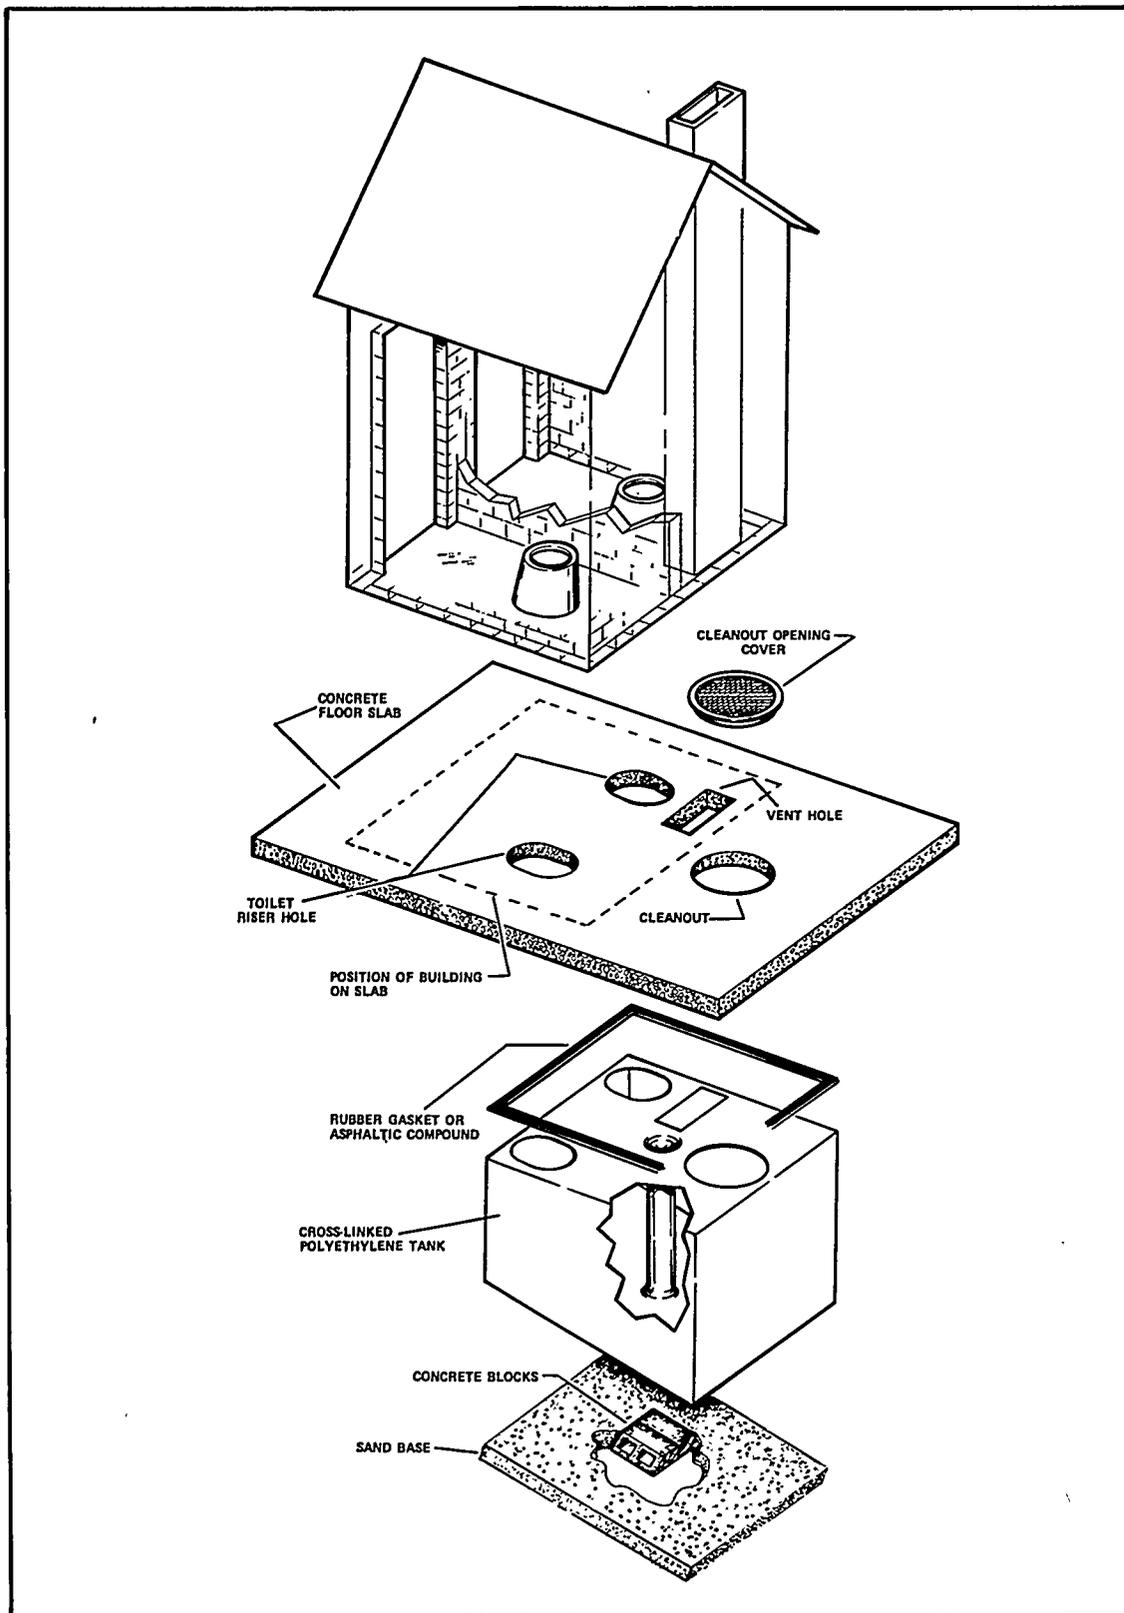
Exploded view of 1,000-gal (3 785-1) tank installation.
